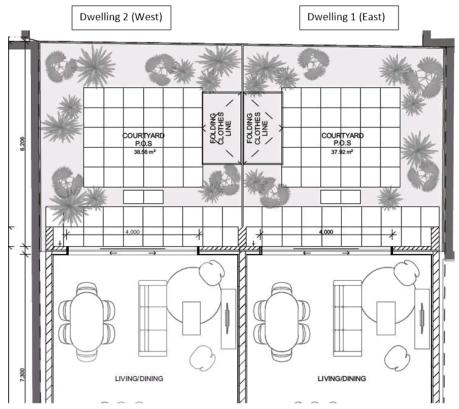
Plan of private open space of dwellings at 36 Federal Street (LXN Architecture)
